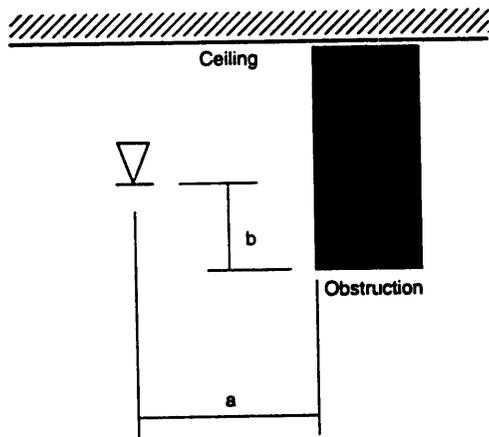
Positioning of sprinklers to avoid obstructions to discharge (ESFR sprinkler).
